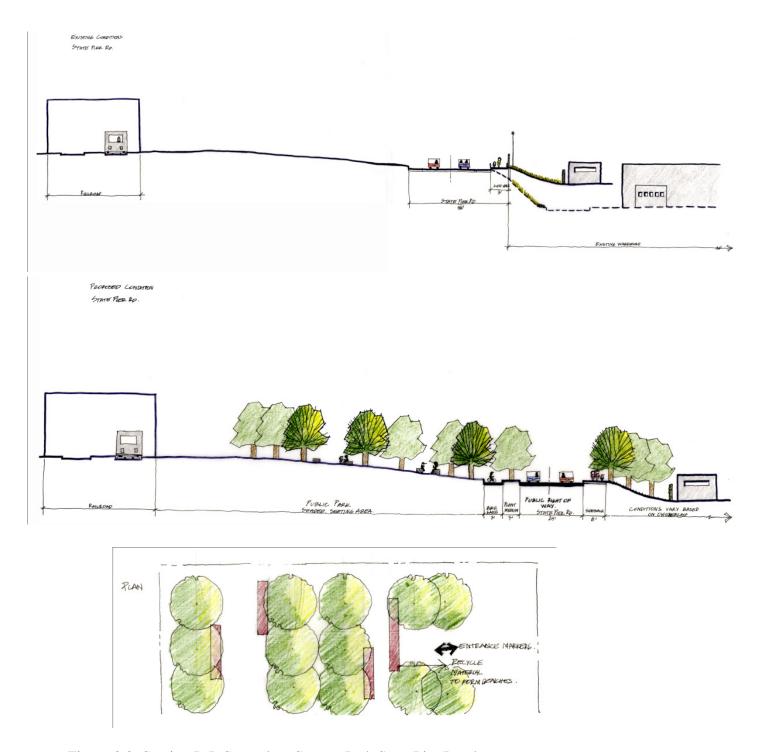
Section L-L Secondary Street - Path State Pier Road
